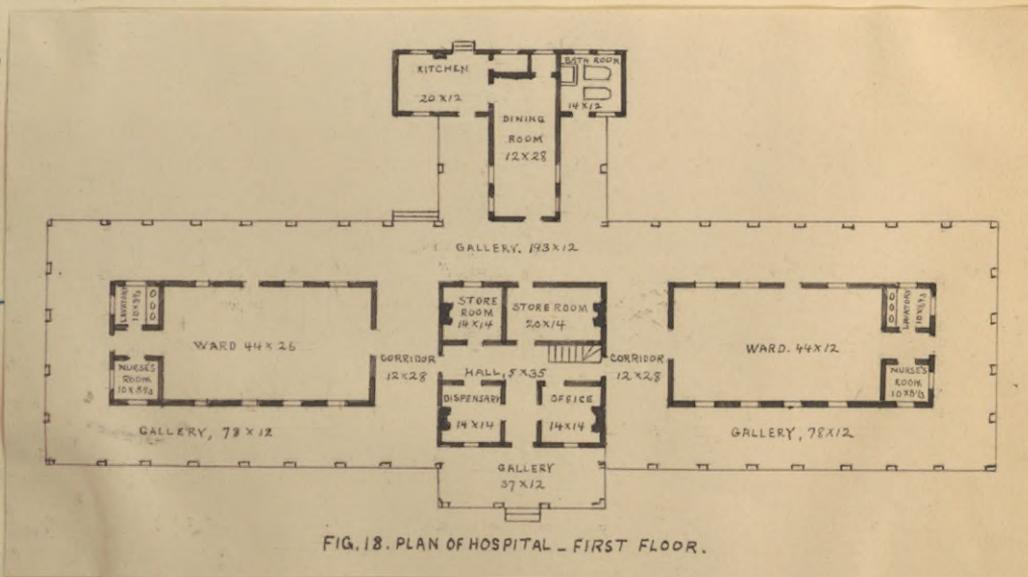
PLAN OF HOSPITAL - FIRST FLOOR.
